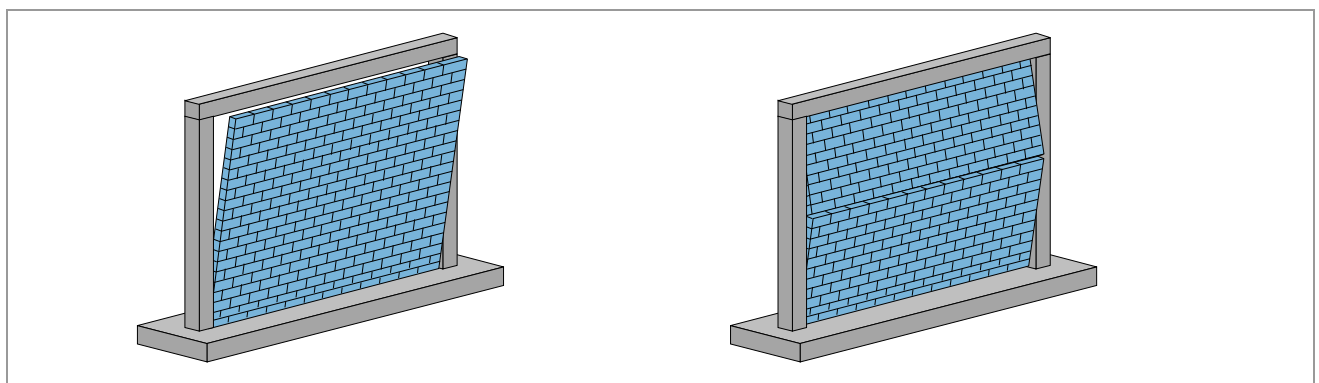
Typical failure modes of masonry infill walls due to out-of-plane loading
